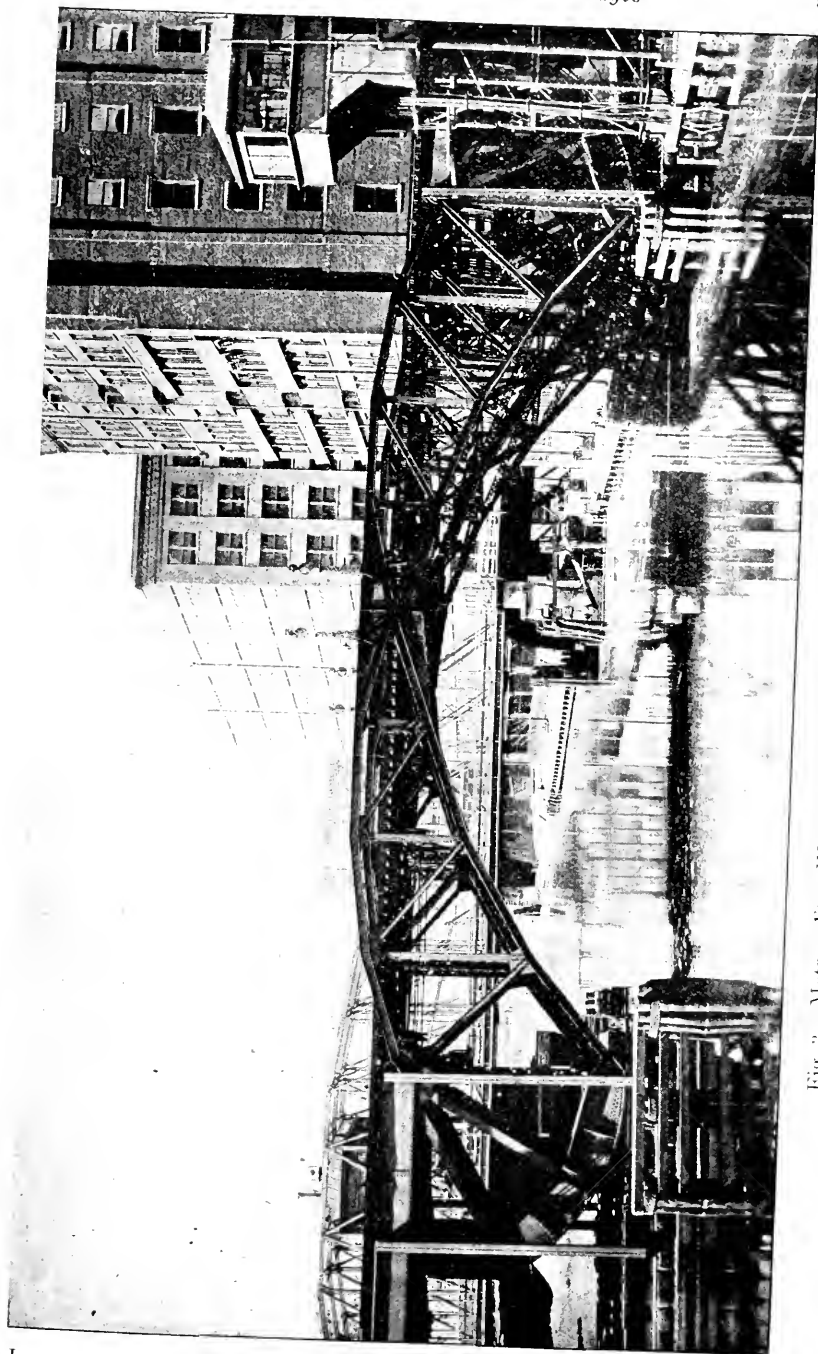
Metropolitan West Side Elevated Railway Crossing the South Branch of the Chicago River.
